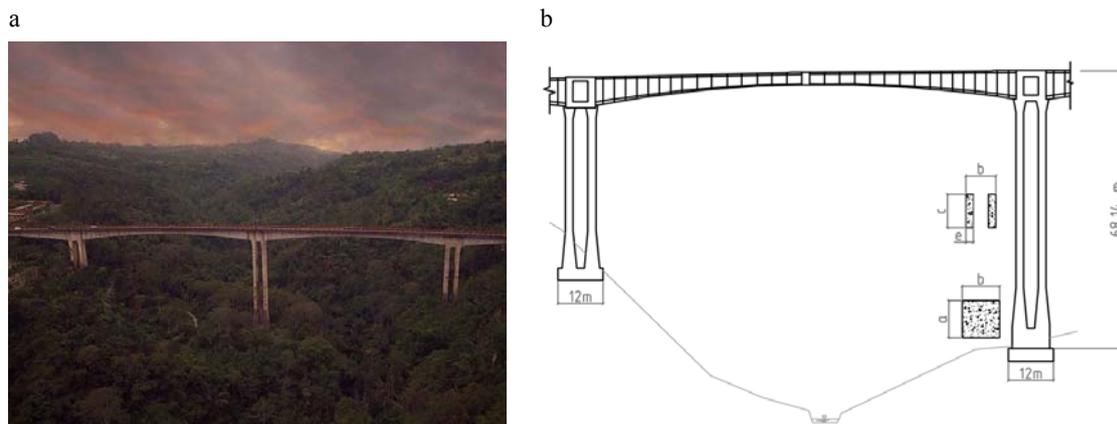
Tukad Bakung Bridge: a – real condition (<https://www.kintamani.id/wp-content/uploads/Jembatan-Tukad-Bakung-Plaga-3.jpg>), b – cross-section of a tall pier bridge (own elaboration based on Artana, Sukrawa & Sudarsana, 2010)
